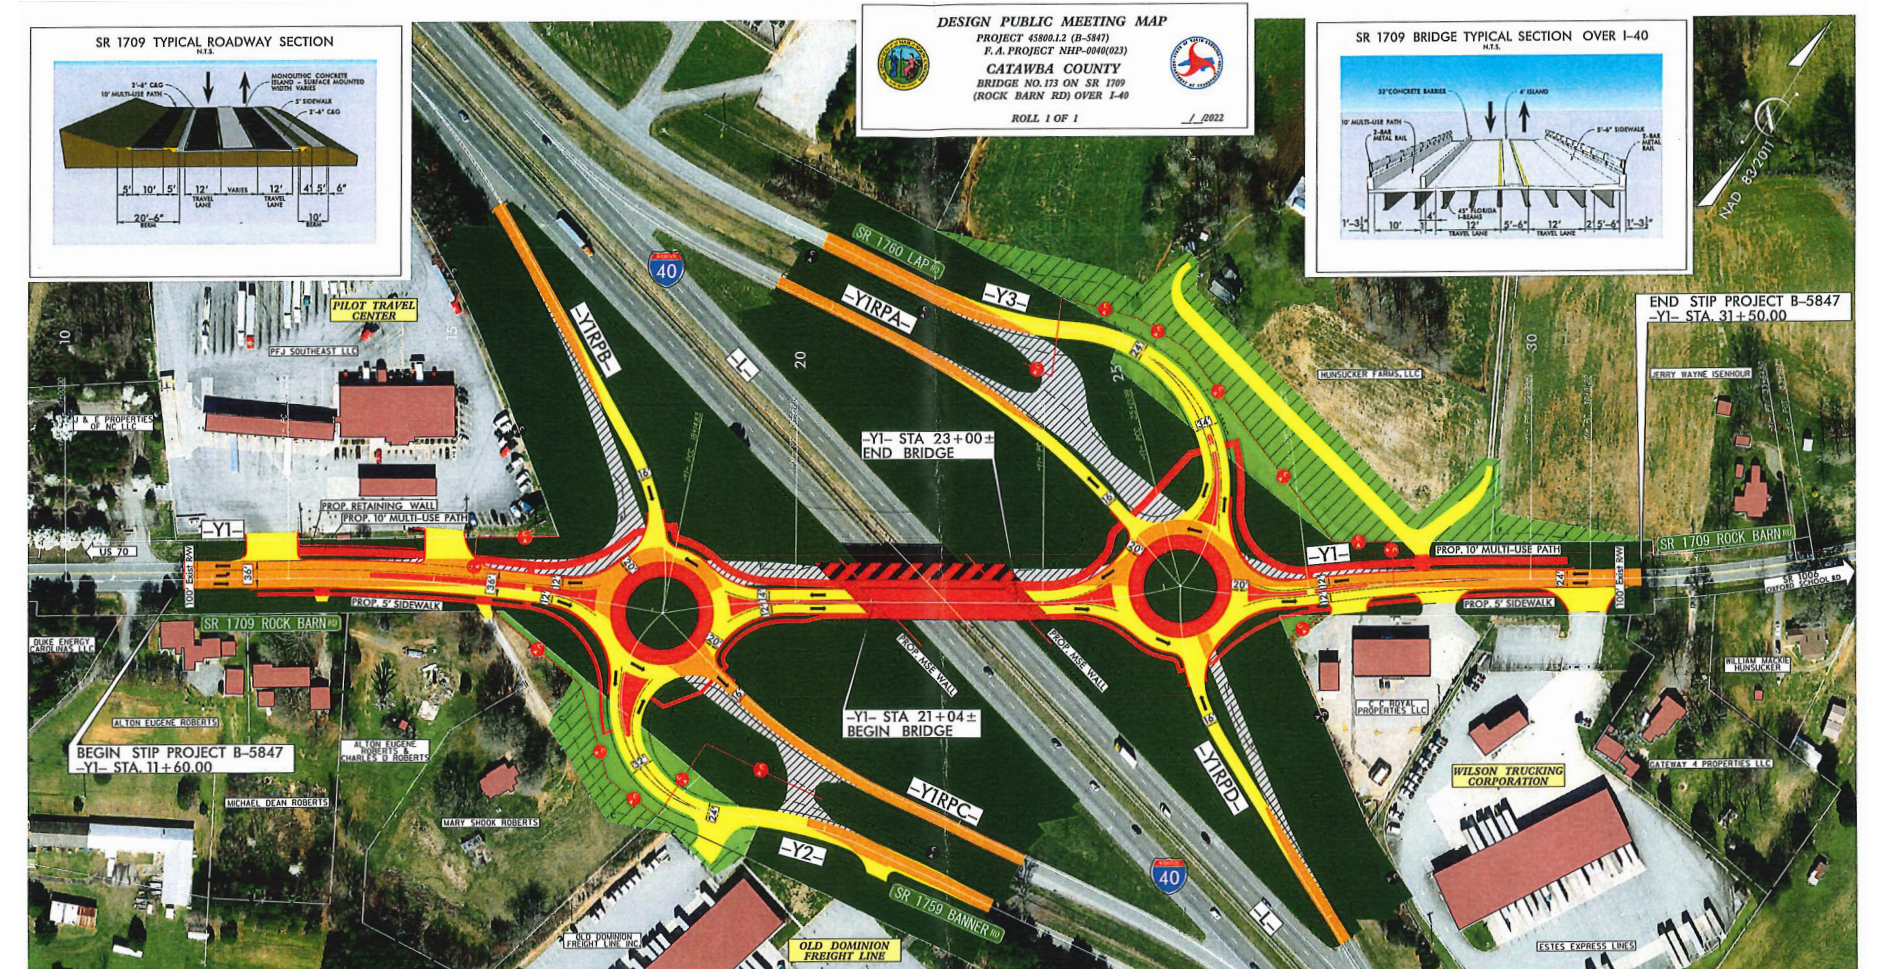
I-40 Roundabouts at Rock Barn Road (Source: NCDOT)
